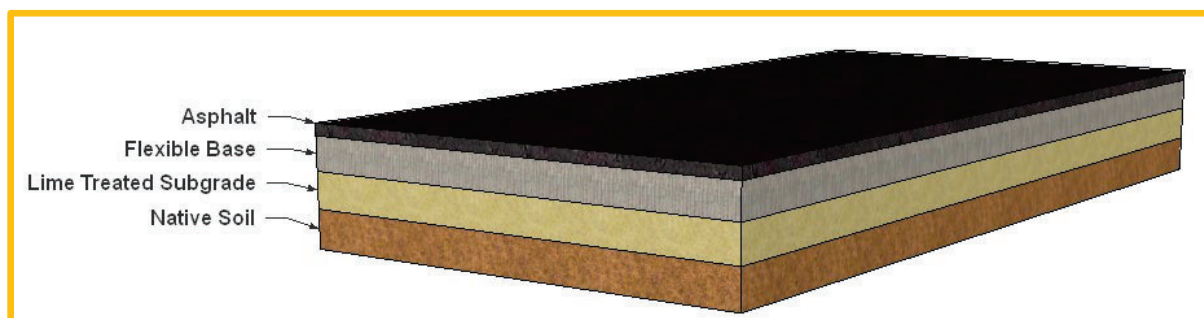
OPTION 2 FLEXIBLE PAVEMENT TYPICAL SECTION
